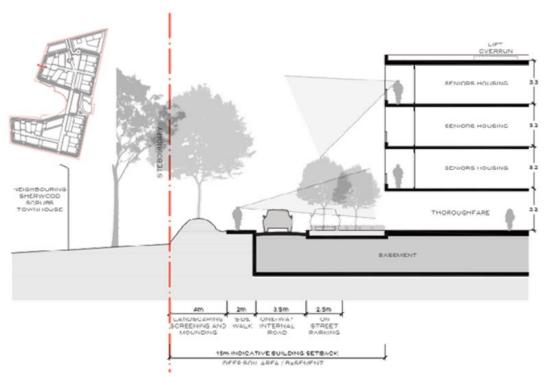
Indicative section from Sherwood Scrubs Townhouses to the west
